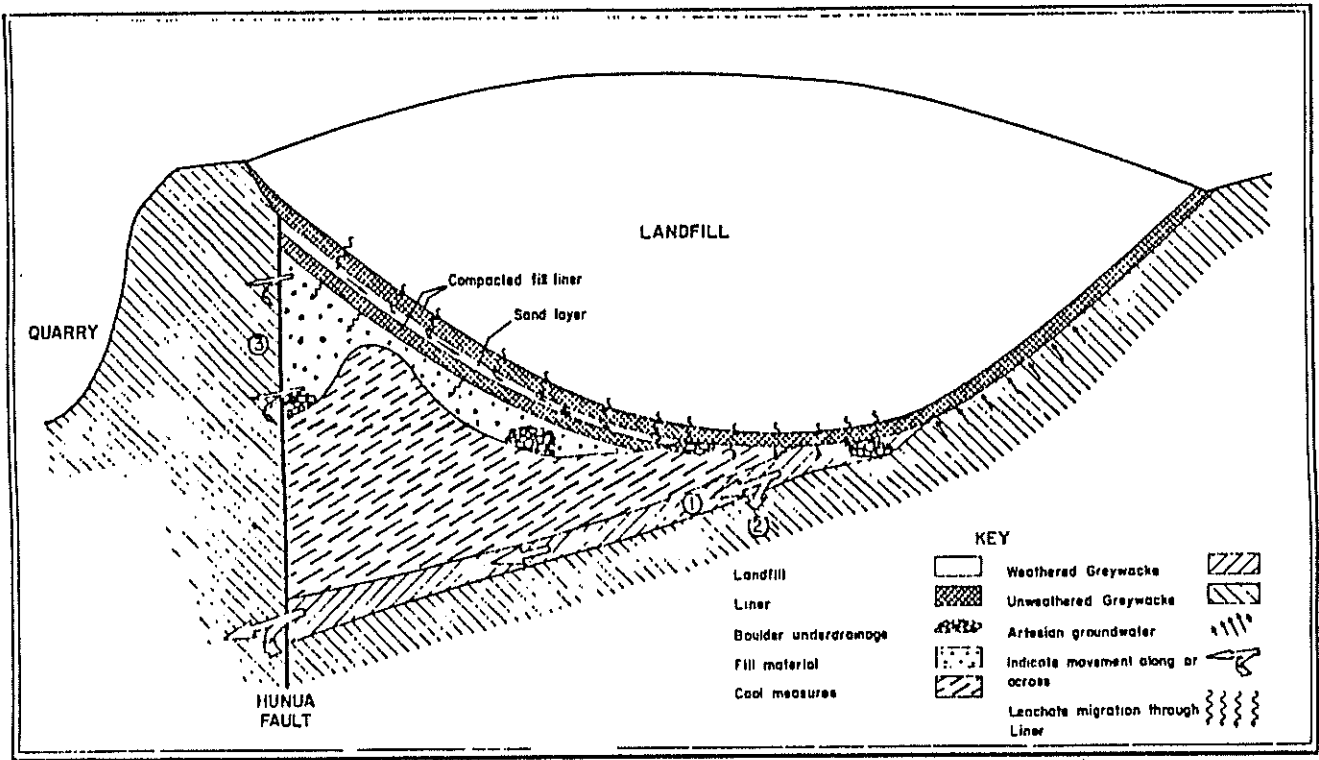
Conceptual Cross-section of Proposed Peach Hill Landfill.
